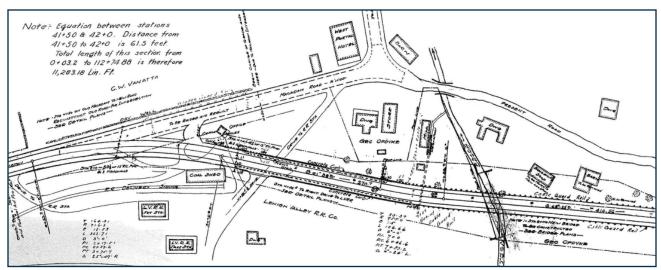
Beginning of new road construction, stations 0+3.00 to 11+00.
